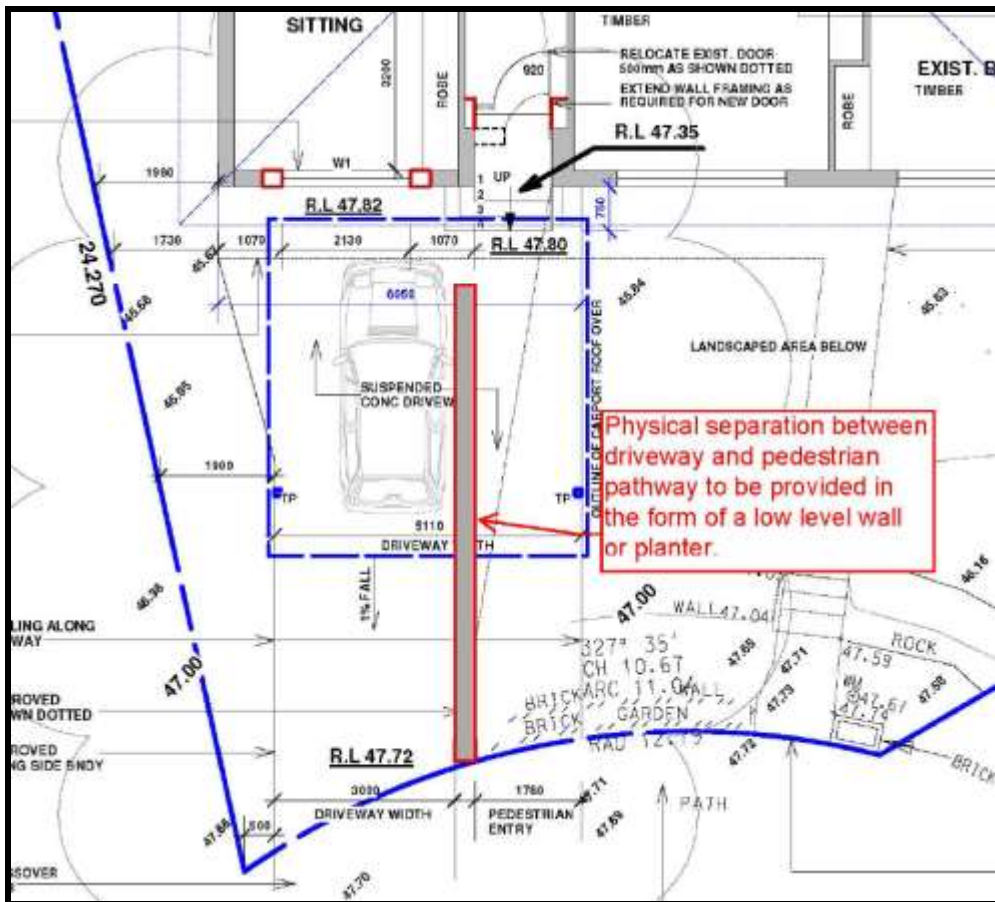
Physical separation between driveway and pedestrian pathway in the form of a low level wall or planter to be provided by a condition of consent.
